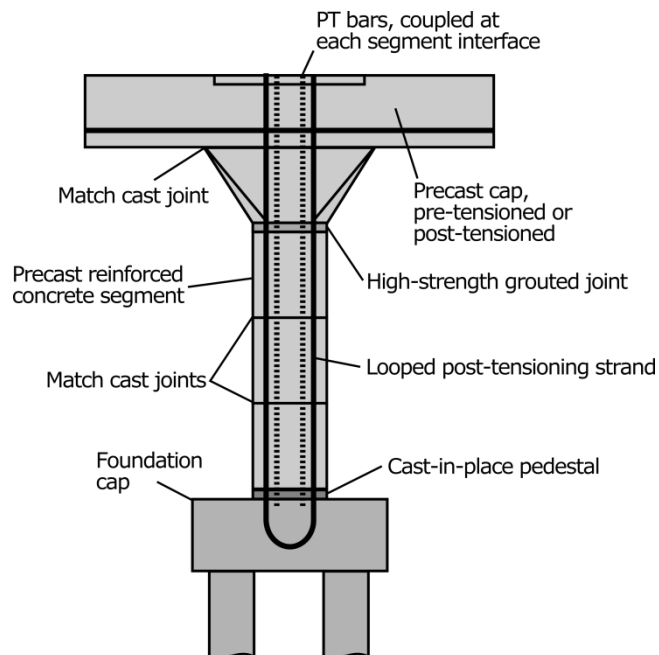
Precast segmental substructure system concept (adapted from Billington et al. 1999).
